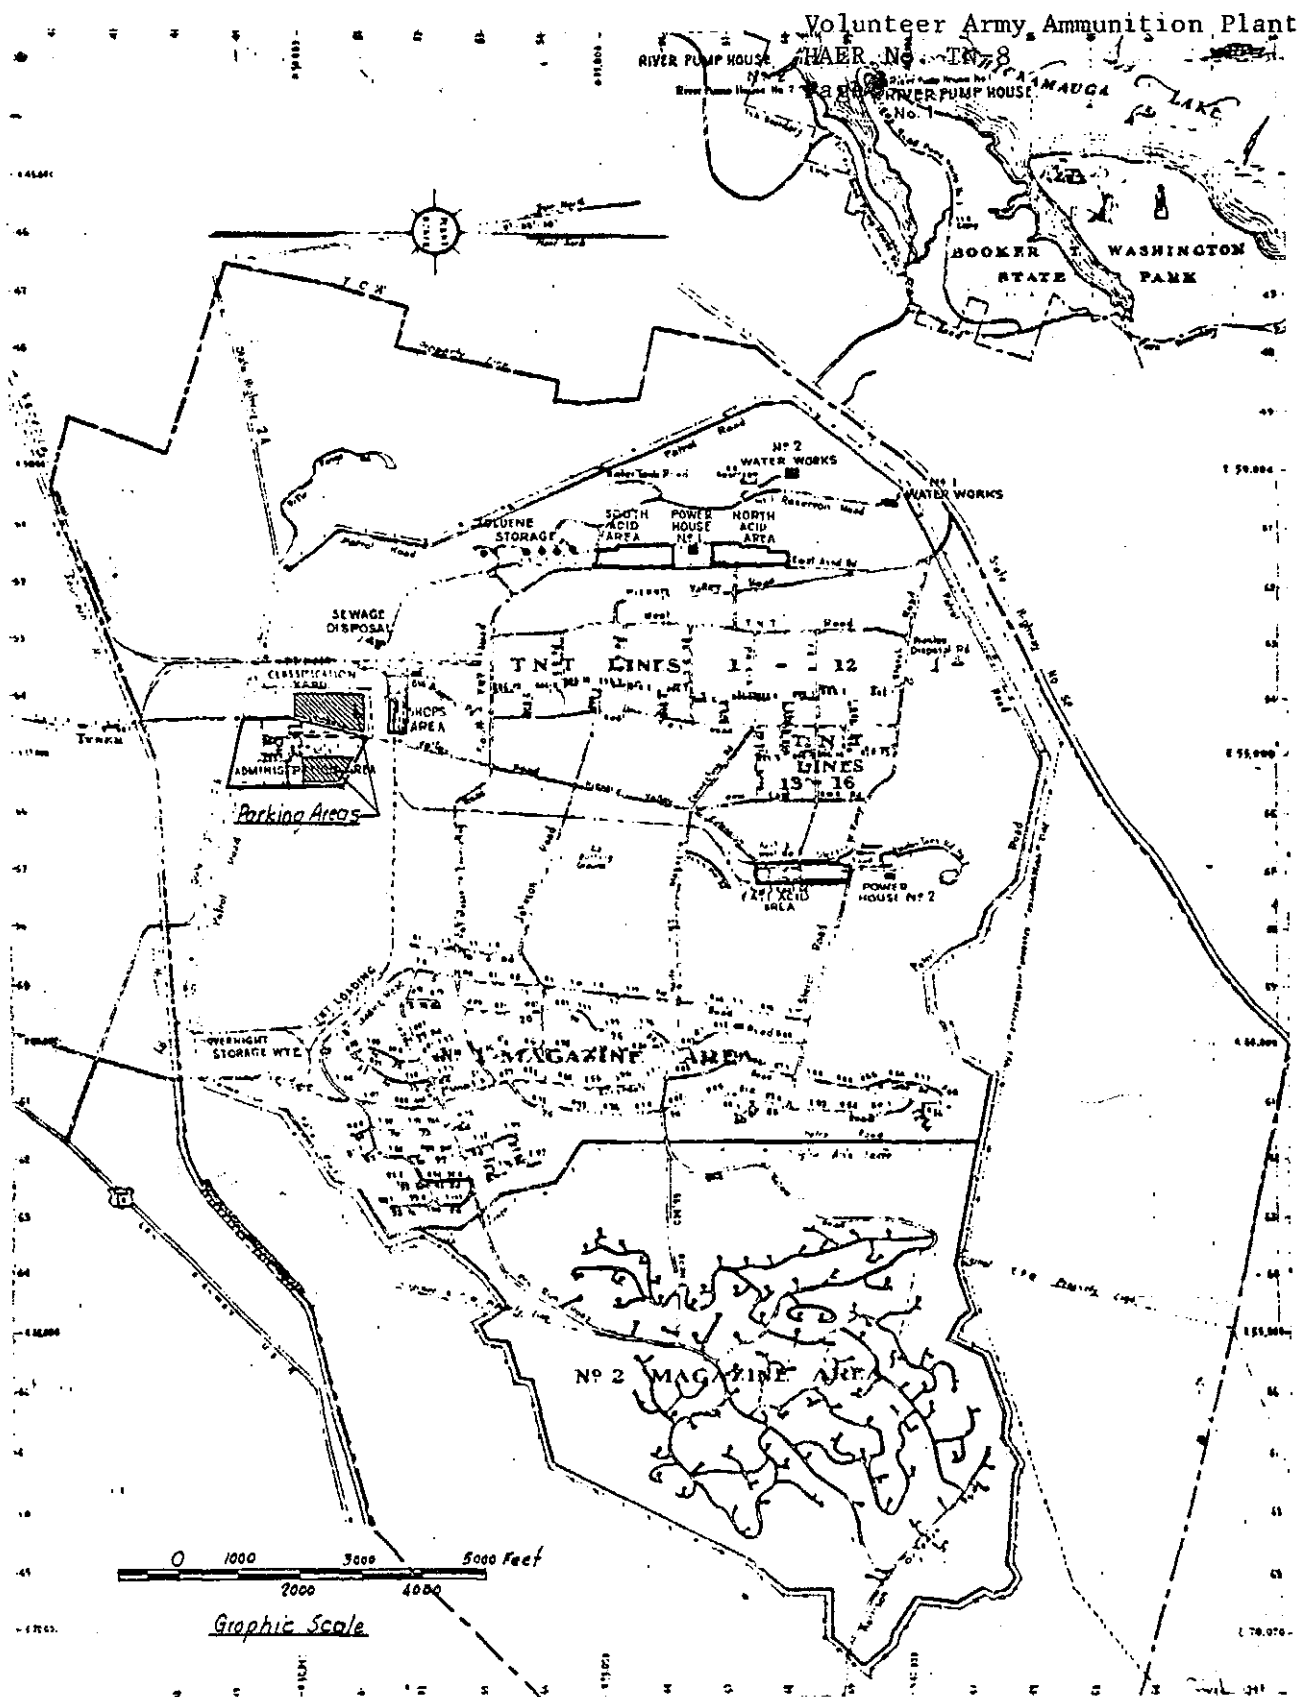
Volunteer Army Ammunition Plant (VAAP). Site plan, 1943.
